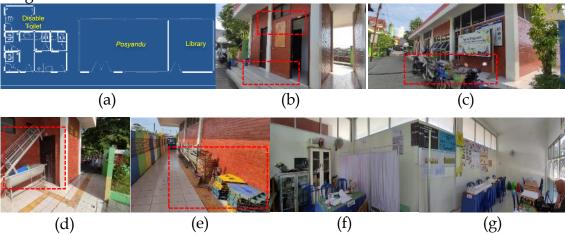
Integrated Buildings. (a) Layout Plan, (b) Openings of Rest Room, (c) Vehicles parked in front of the Rest Room, (d-e) Corridor, (f-g) Posyandu Room
